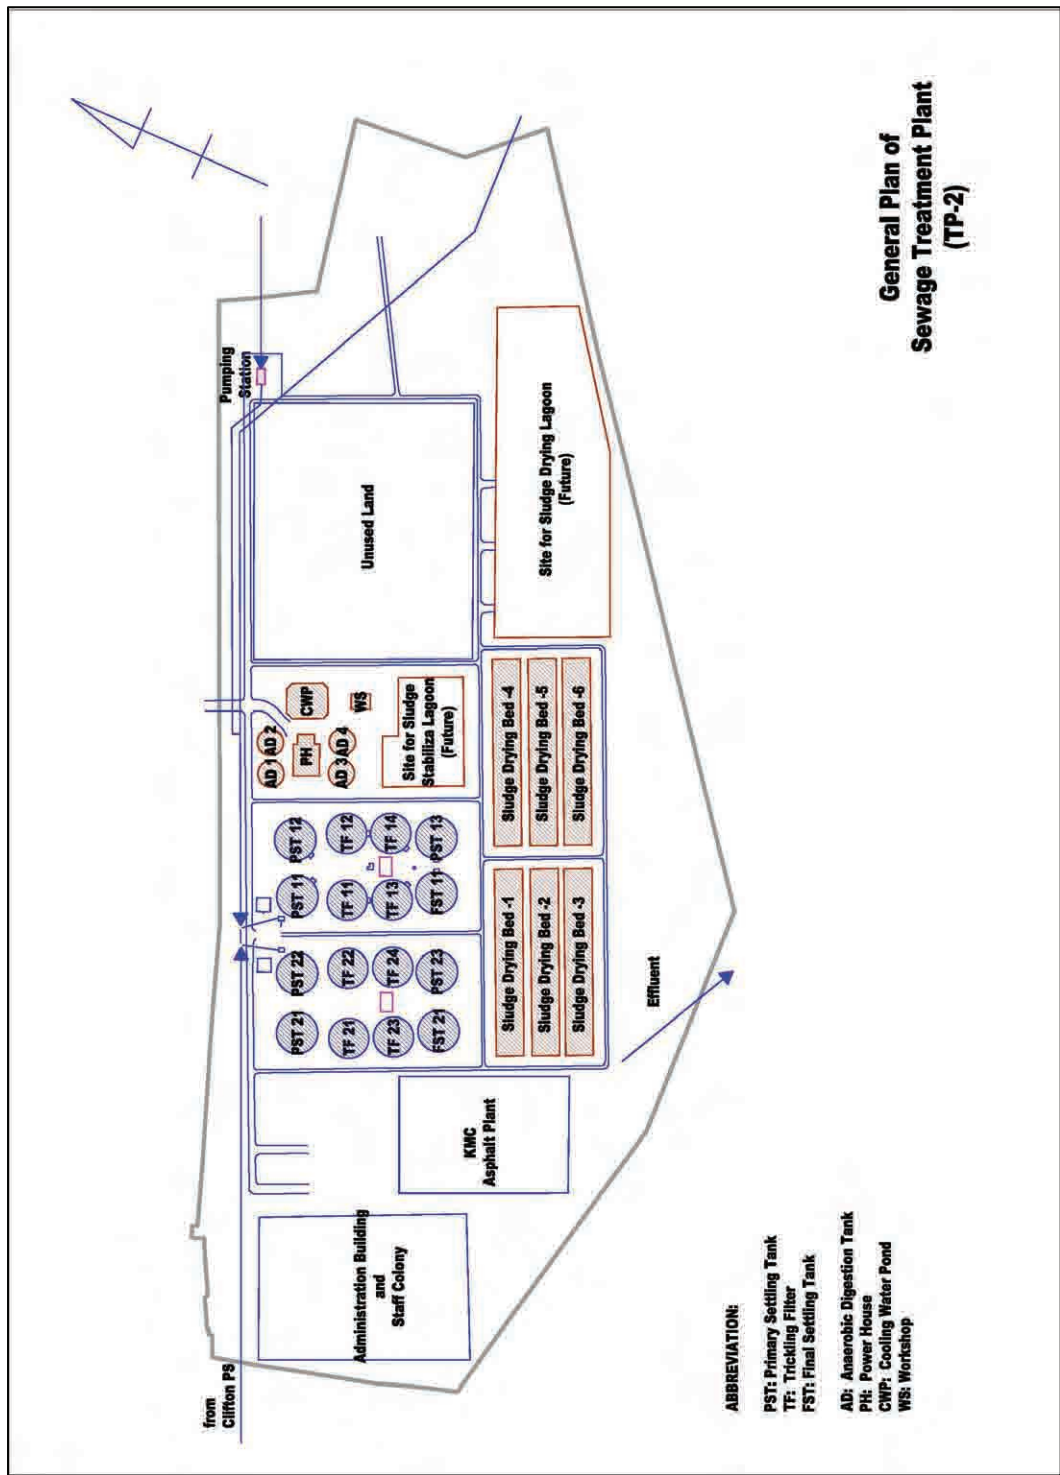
General Plan of Sewage Treatment Plant TP-2
